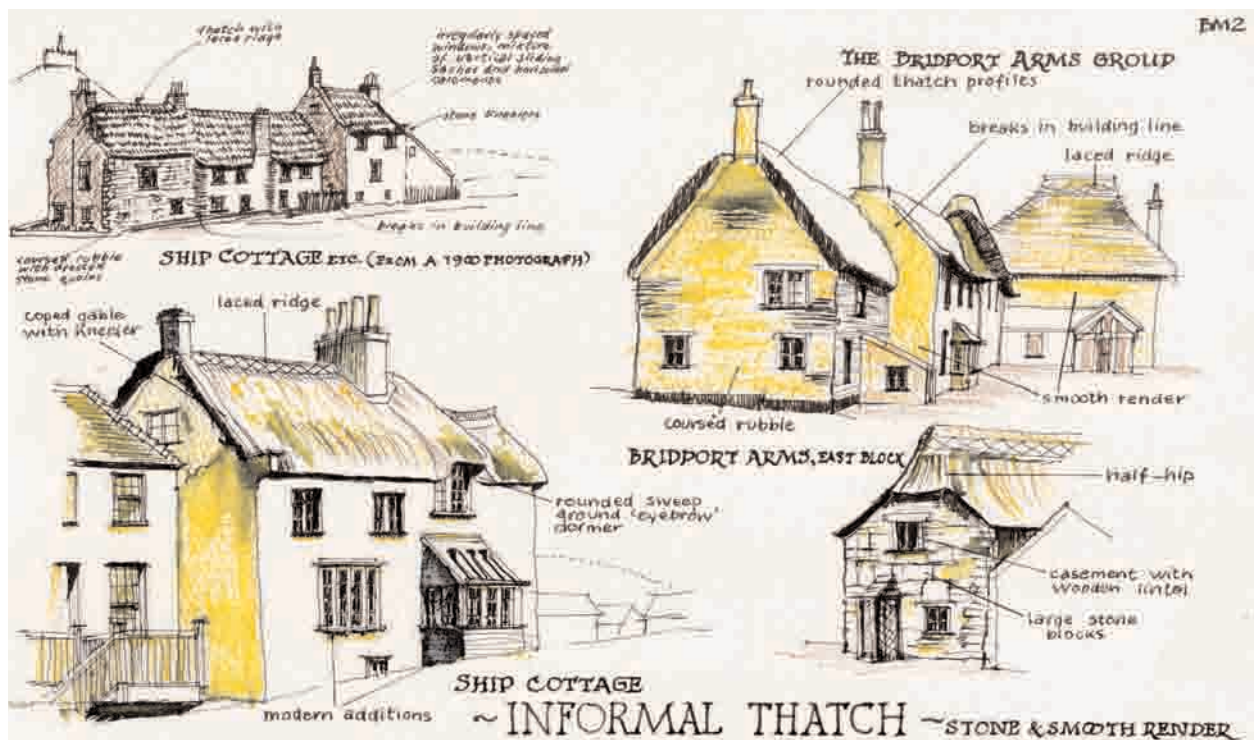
'Informal Thatch Style' - rows or groups of stone or render with varying roof lines. The Bridport Arms and the Ship Cottage row have varied building lines, which produce a break-forward of elevations and the exposure of parts of flank walls.
